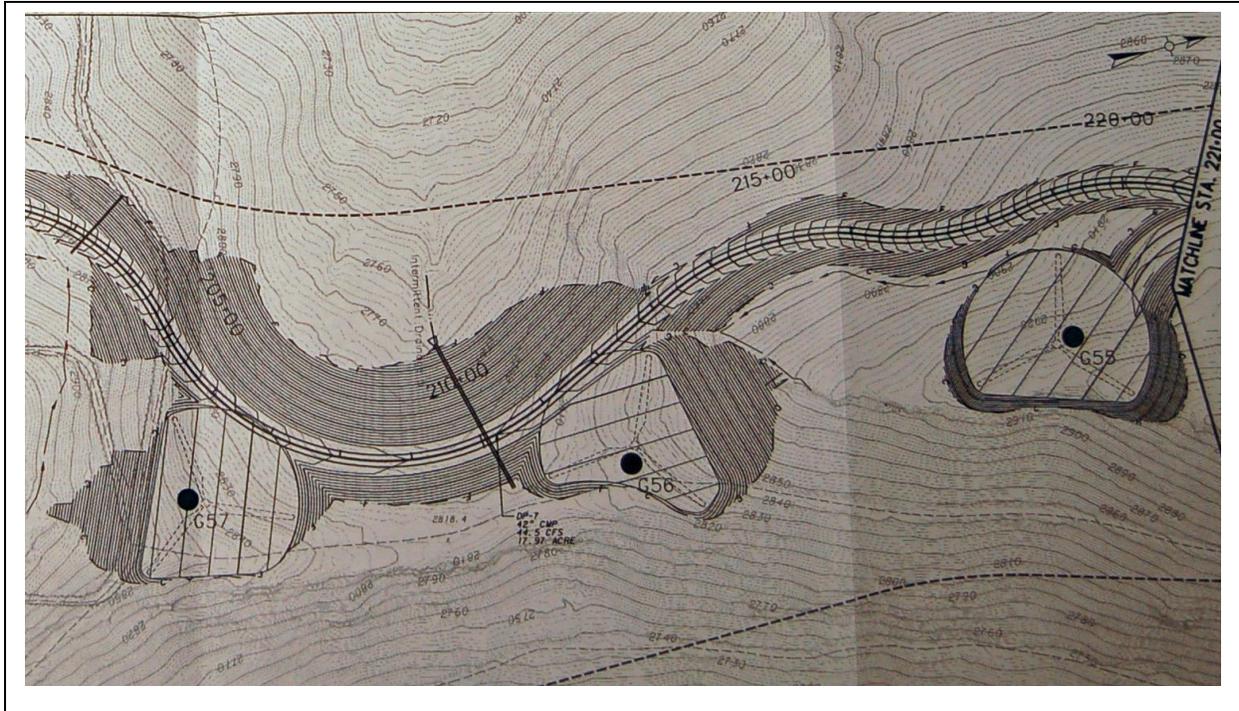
Example of construction plan sheet submitted to WVDEP by AES Laurel Mountain, Inc. showing existing contours and also construction contours. Note that the contours along the roadway (linear feature) do not correspond to the contours of the existing land surface because the construction activities will change the topographic expression.
